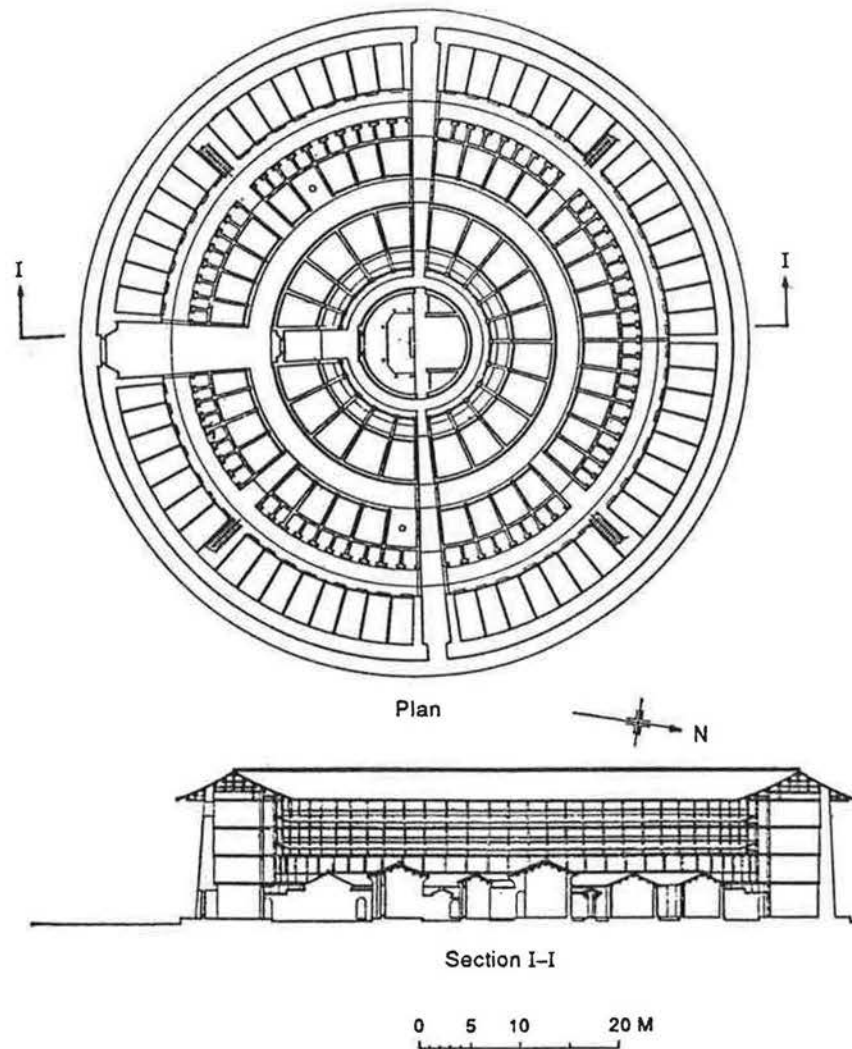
The largest earthen tower—Chengqi Tower, Plan (above), Section.
